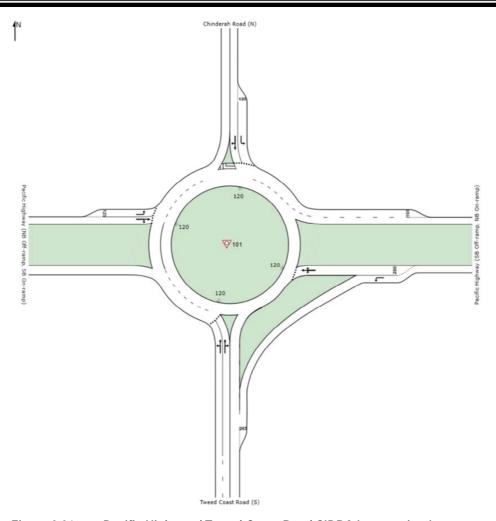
Pacific Highway / Tweed Coast Road SIDRA Intersection Layout
